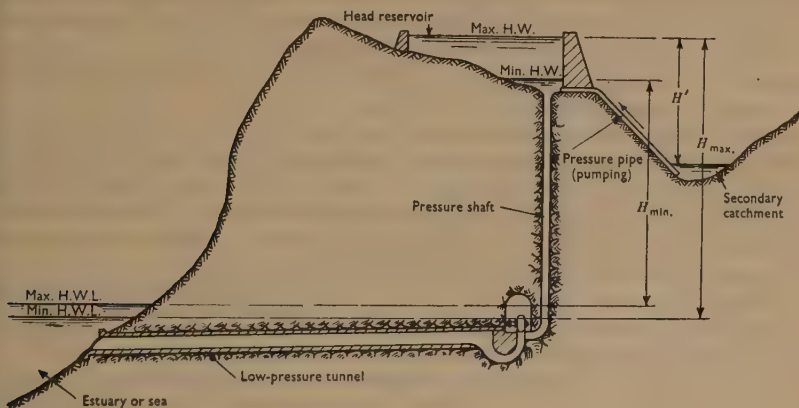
POSSIBLE APPLICATIONS, TO A COASTAL RIDGE OF HILLS, OF A PUMPED-STORED SCHEME WITH UNDERGROUND POWER STATION
